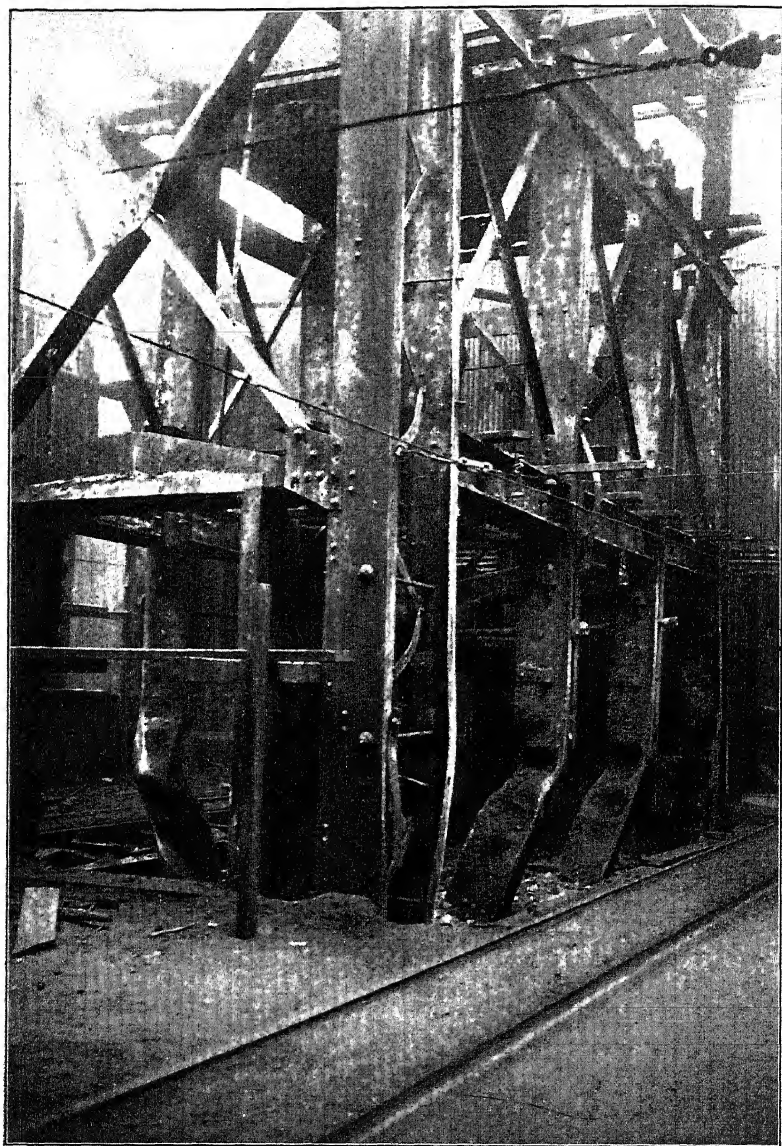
No. 4 FURNACE, SHOWING STEEL-WORK OF OLD FURNACE BEING DISMANTLED. THE CHANNEL-IRON COLUMNS AT EACH CORNER WERE PRACTICALLY SUPPORTING THE WHOLE TOP.
